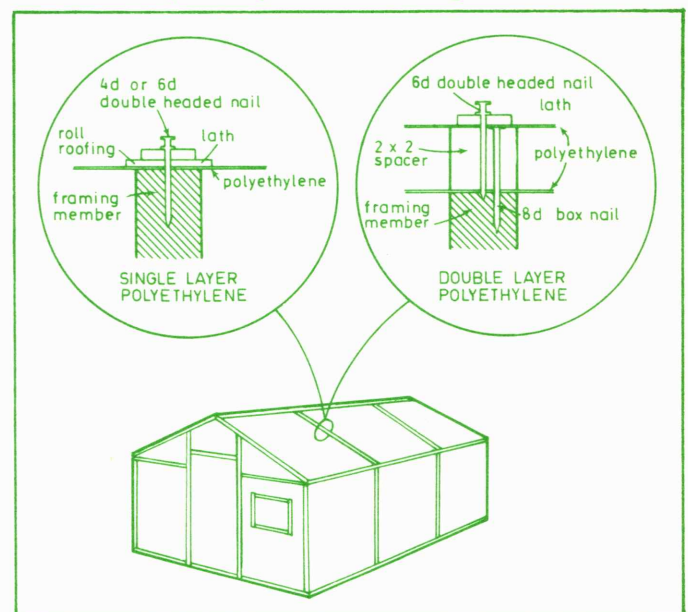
Fastening details of single layer and double layer polyethylene covering. The double covering can cut heat loss by one-third. Polyethylene must be fastened every 4' of greenhouse length to prevent wind damage.
